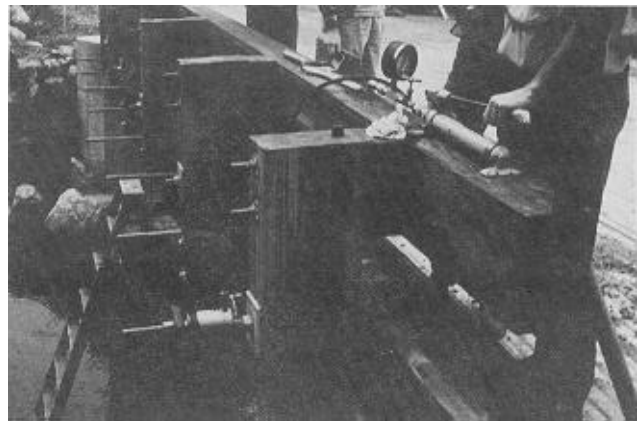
Tensioning bars with hydraulic jacking system. (M92 0009-6)
